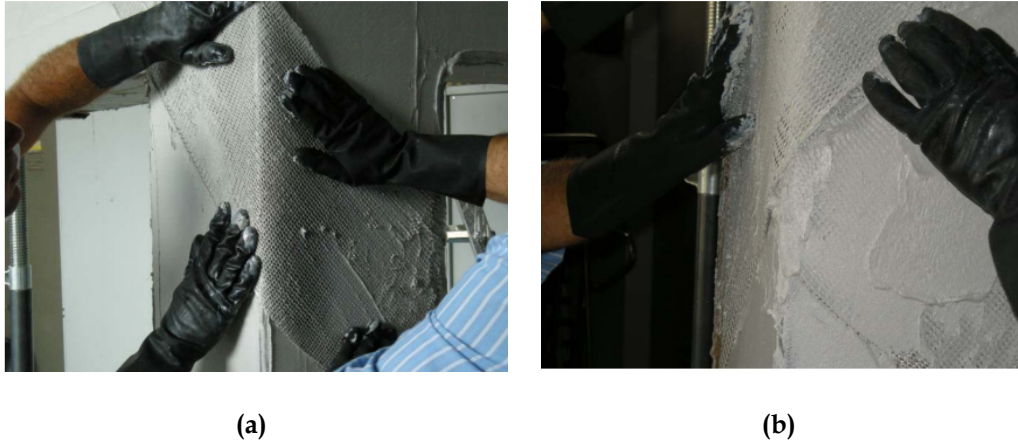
1: Application of reinforced fabric wrapping on RC column; (a) application of first layer of reinforcement; (b) application of second layer of reinforcement, (ReLuis 2011)
